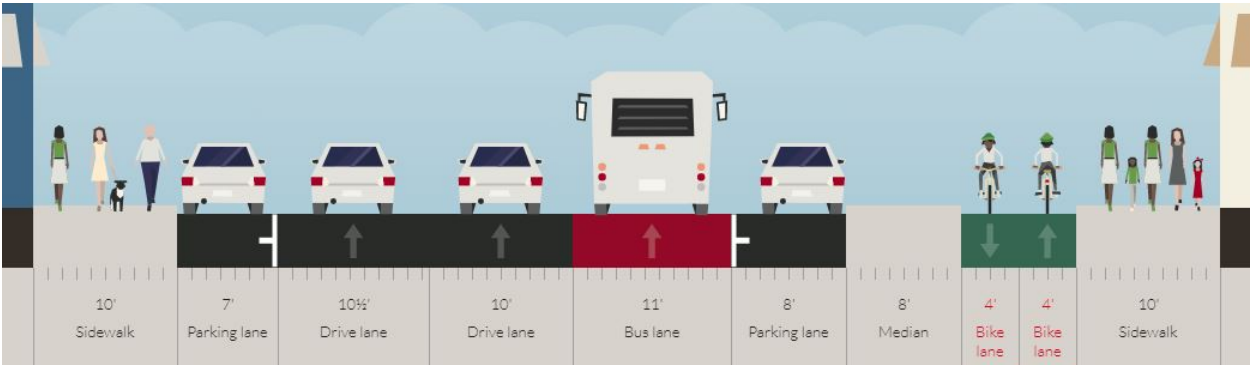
Typical Cross Section of Folsom Street between 6th Street and 5th Street, looking east
